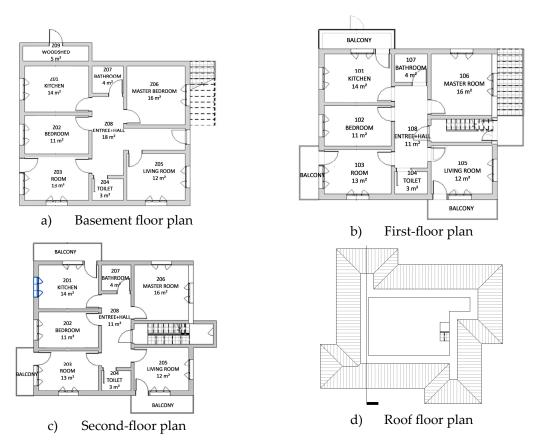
Residential Floor Plans a) ground floor plan, b) 1st floor plan, c) 2nd floor plan d) roof floor plan.
